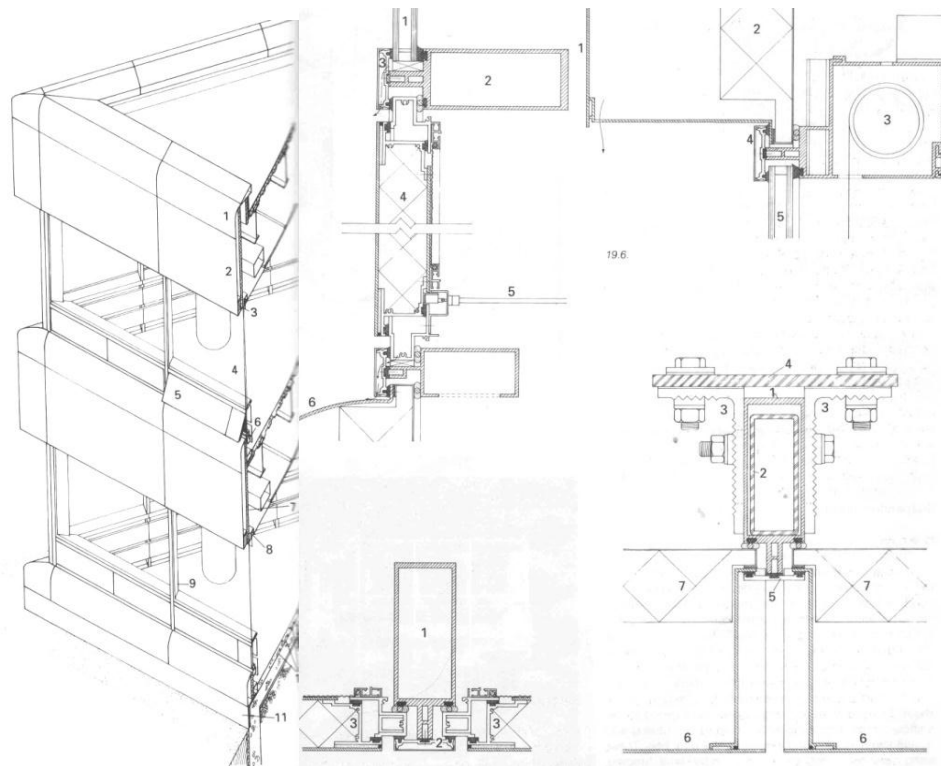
Partial Isometric Section and Sectional Details for Philip Morris Center of Spandrel Panel Curtain Walling System (Brookes, A, and Grech, C., 1996).
